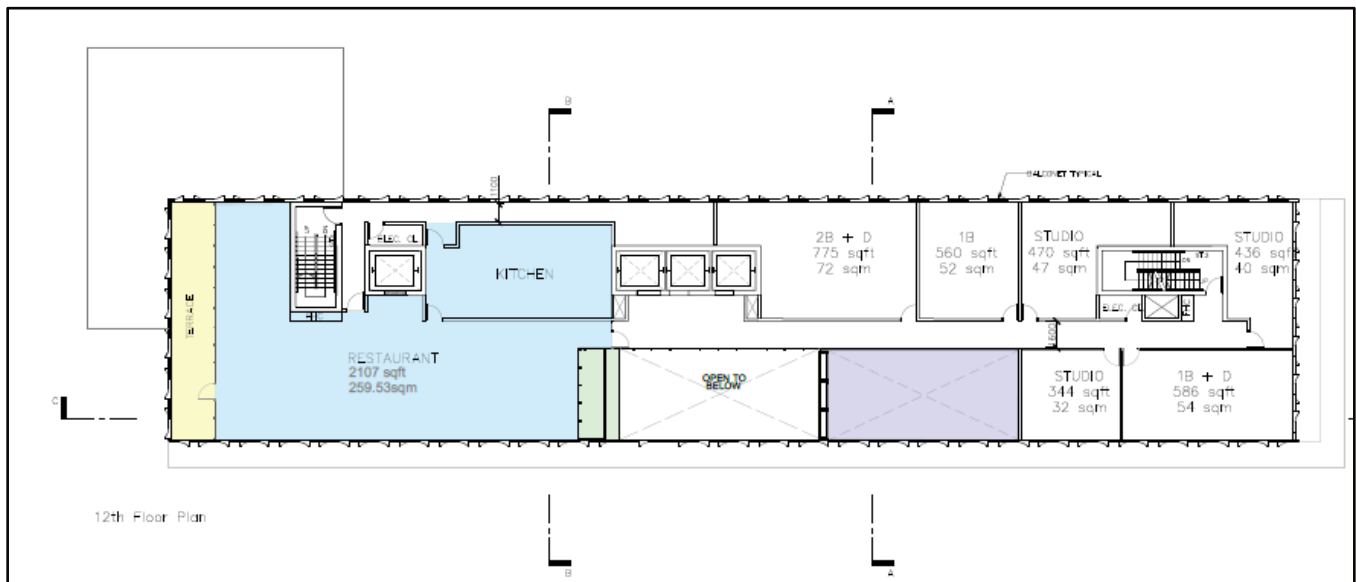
Twelfth Floor Plan, Prepared by Hout Architecture
